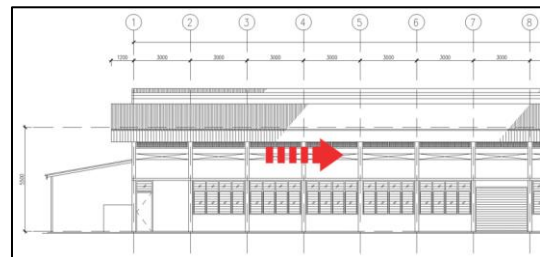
Part of Block D elevation drawing indicating inspection sequence for window and door opening component
